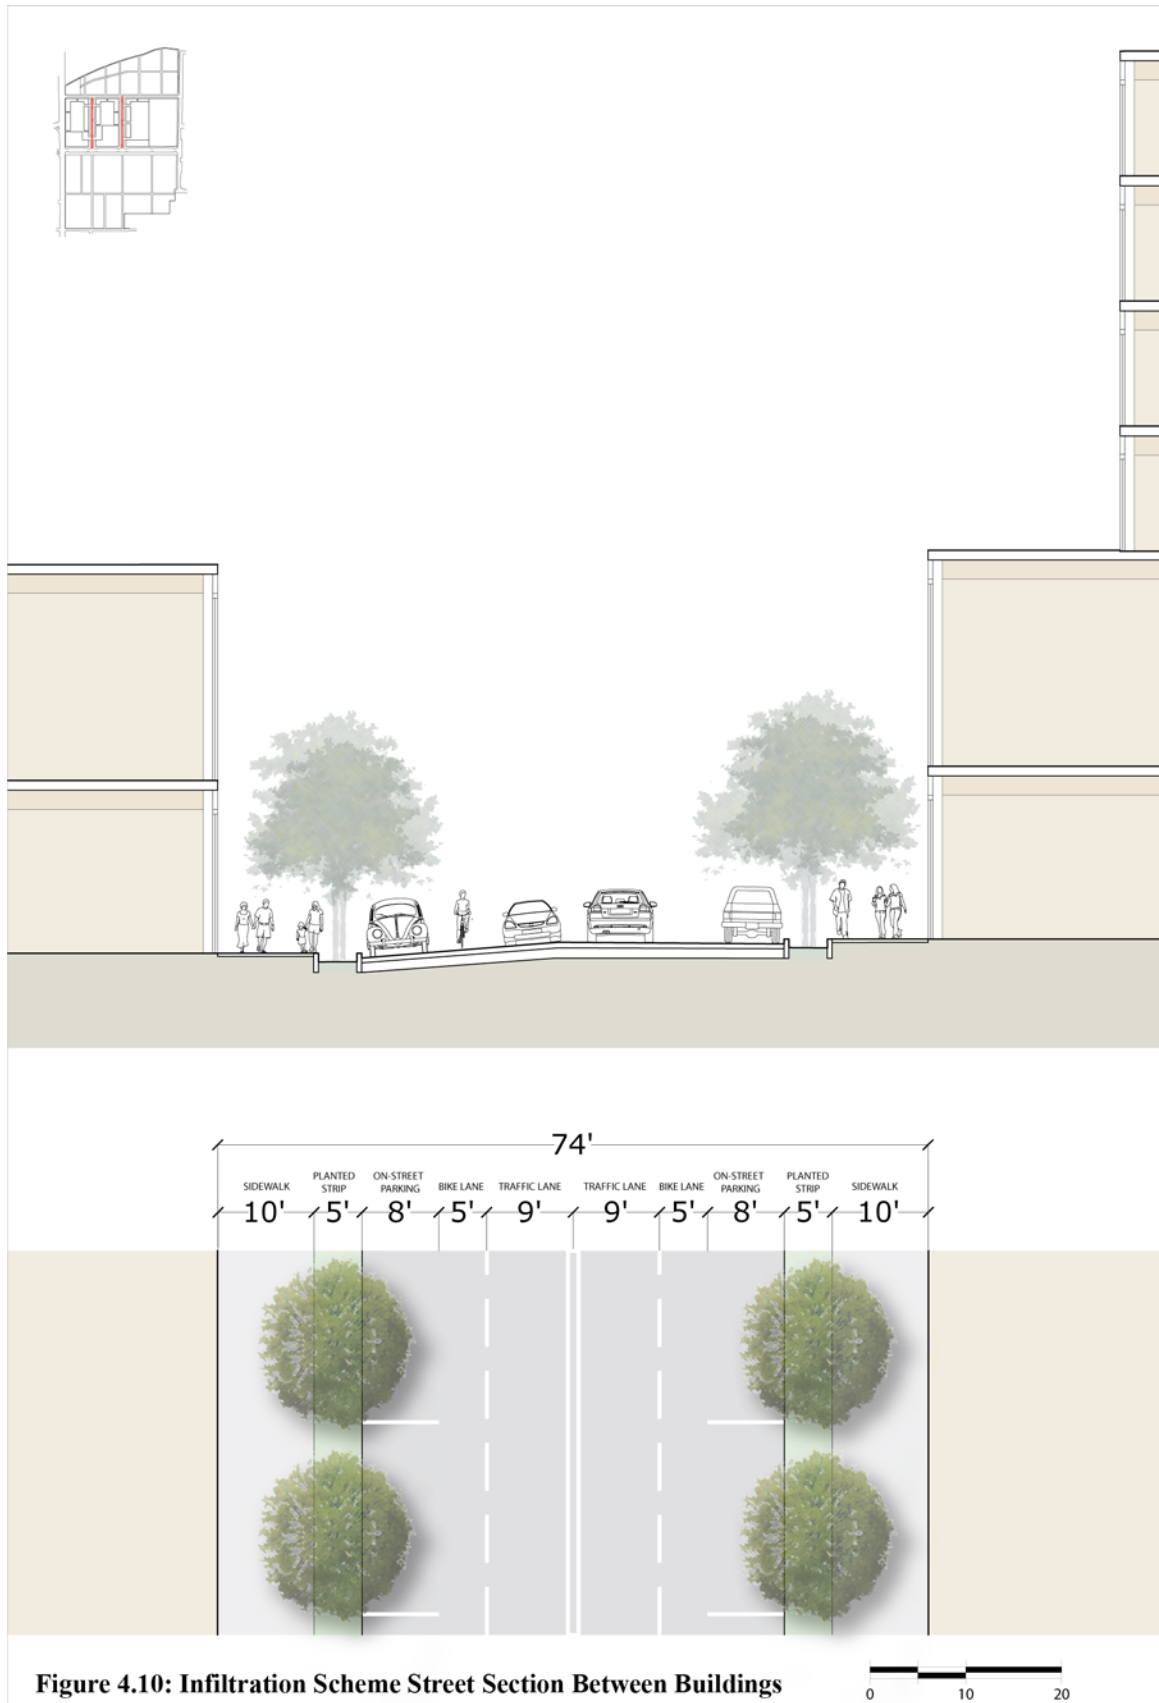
Infiltration Scheme Street Section Between Buildings
